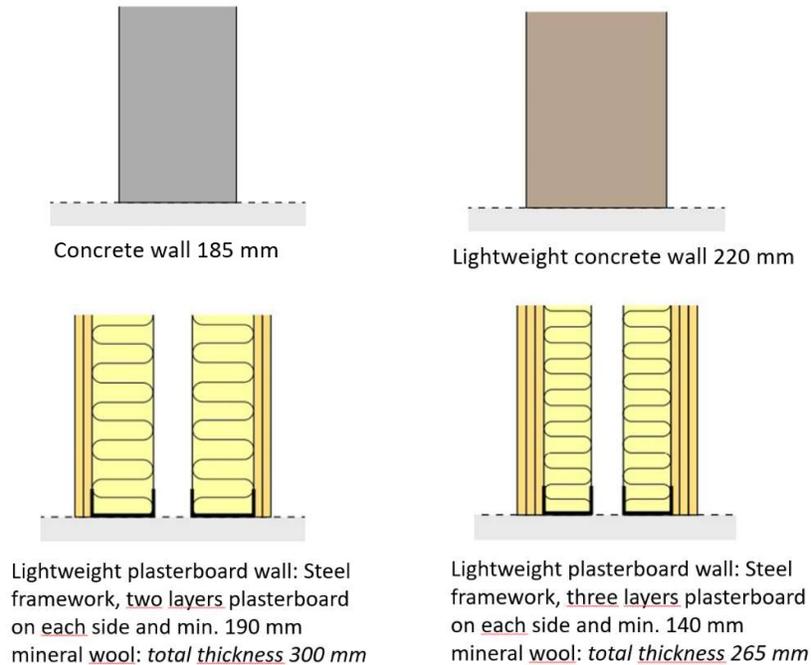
Wall types - examples of walls between dwellings that expect to fulfill the requirements and recommendations for sound insulation, according to SBI 237. The wall types are found under certain assumptions for the adjacent walls, floor slabs and room size. Therefore, the examples should not be used without further analysis of the actual rooms. Figures are from SBI 237 (Rasmussen, Petersen, & Hoffmeyer, 2011).
